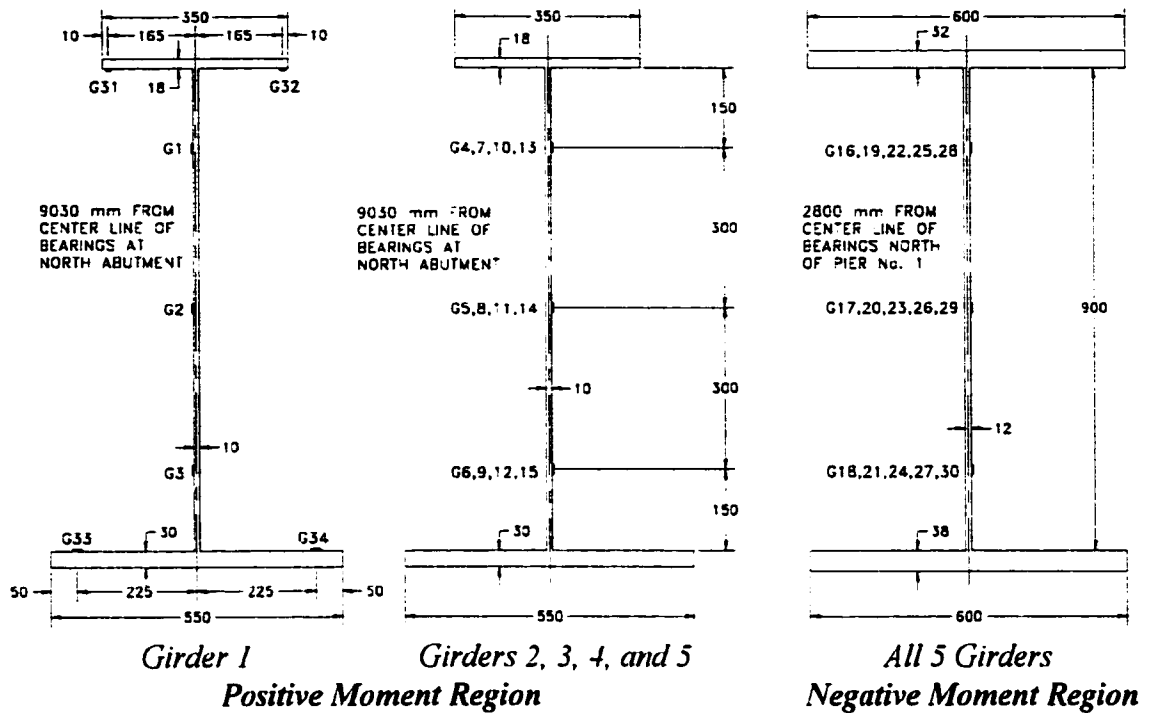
The Three Girder Type Used and Strain Gauges Layout
